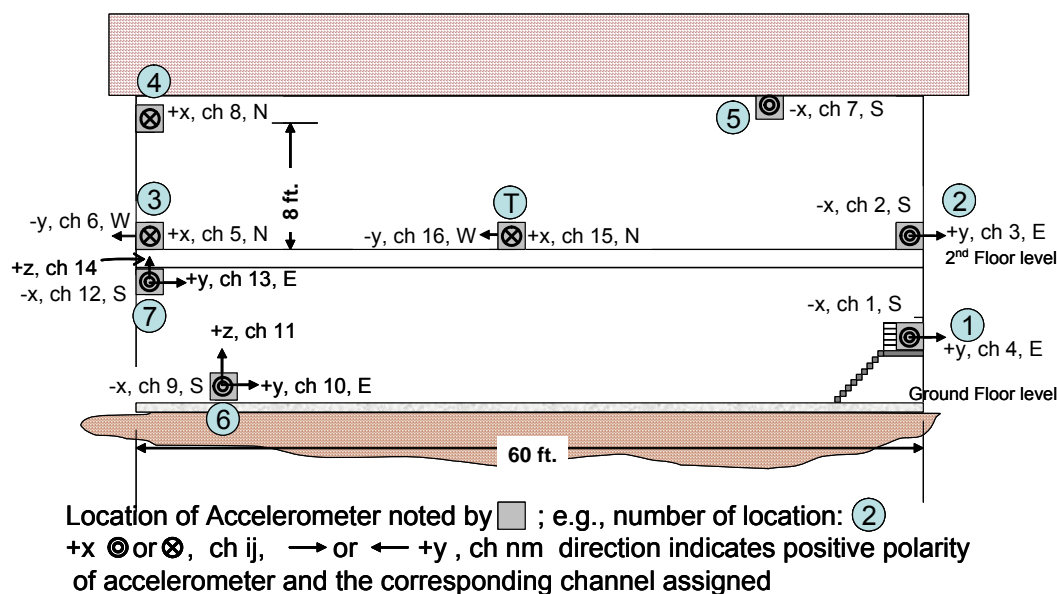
South Elevation Schematic Showing Numbered Locations and Orientations of Accelerometers
